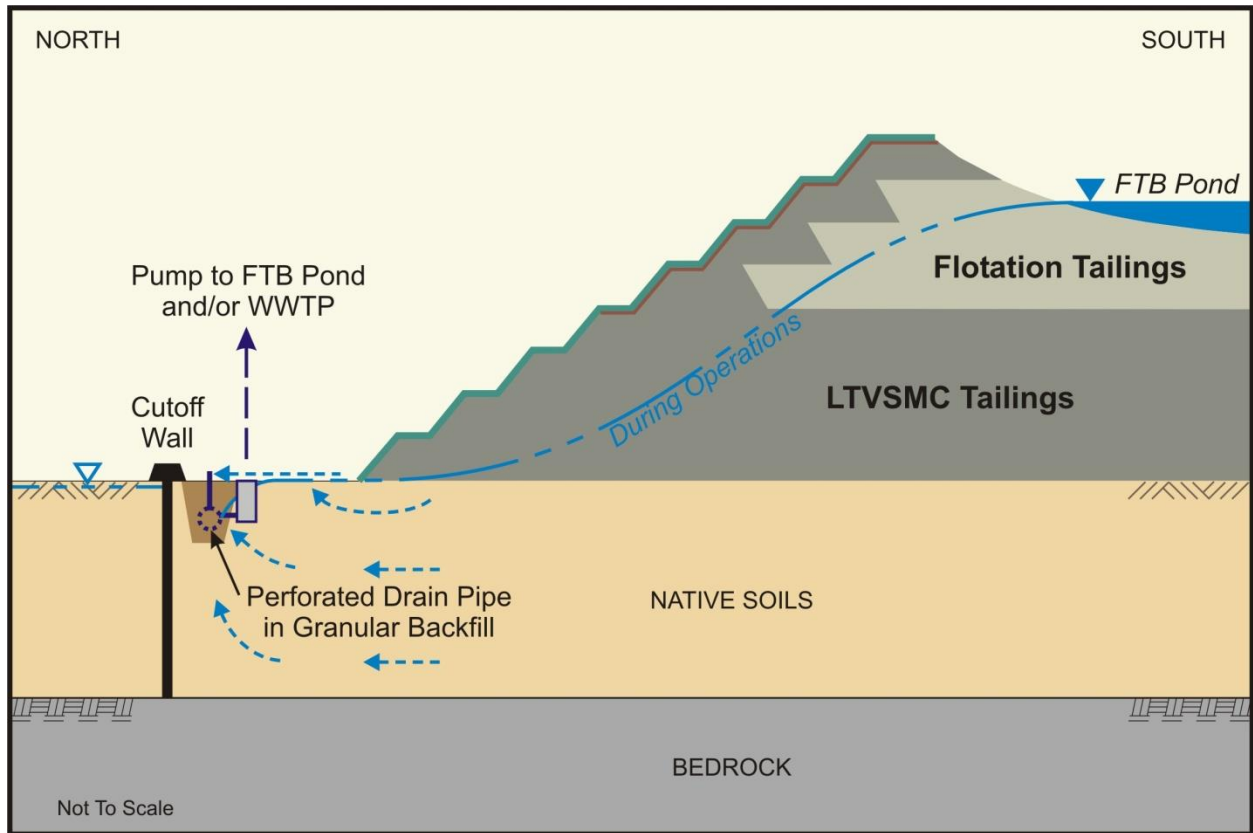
Conceptual Cross-Section: FTB Seepage Containment System
